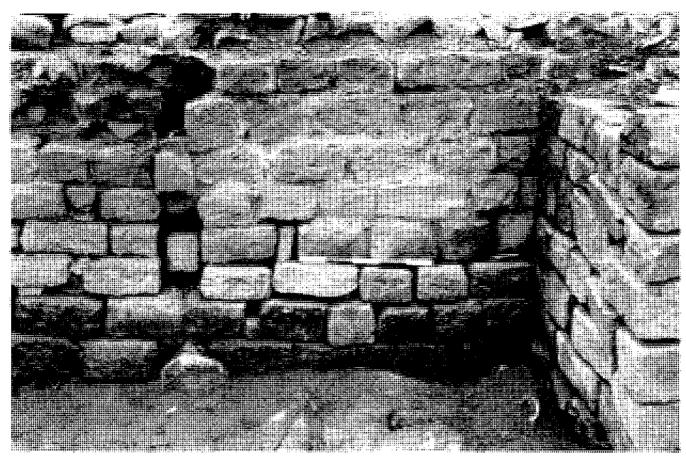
Surviving pointing on outside of south wall of Building 197 (18)
